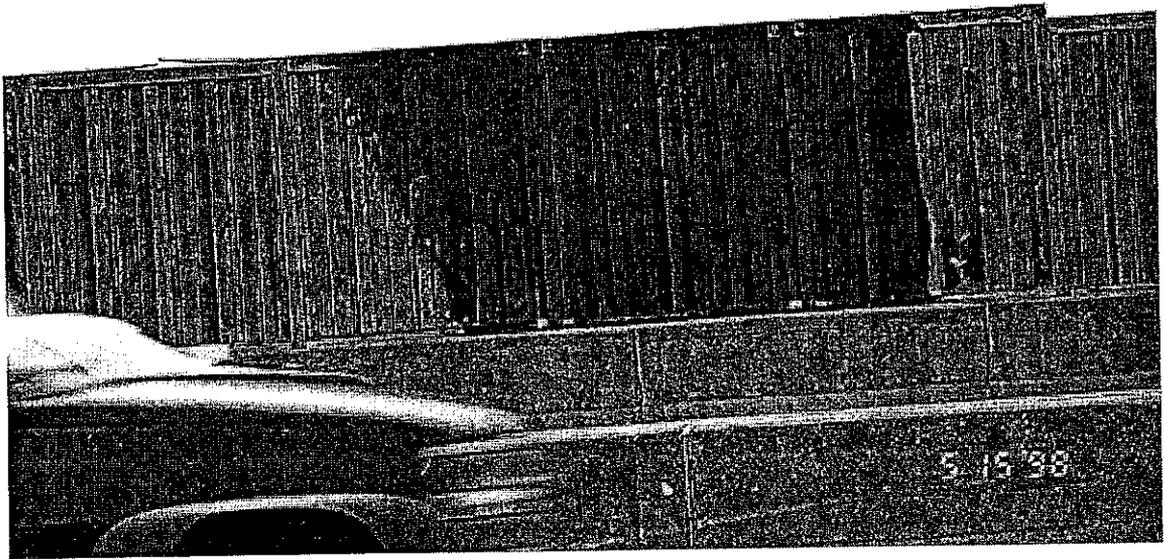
Glue-laminated wood wall damaged by fire, I-290 at St. Charles Road.
